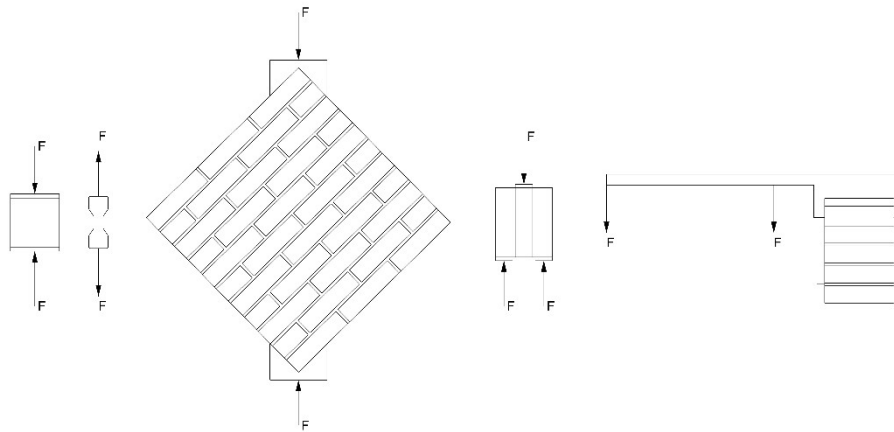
From left to right a) compression loading b) tensile loading c) diagonal loading d) masonry triplet loaded in shear e) wrench test
